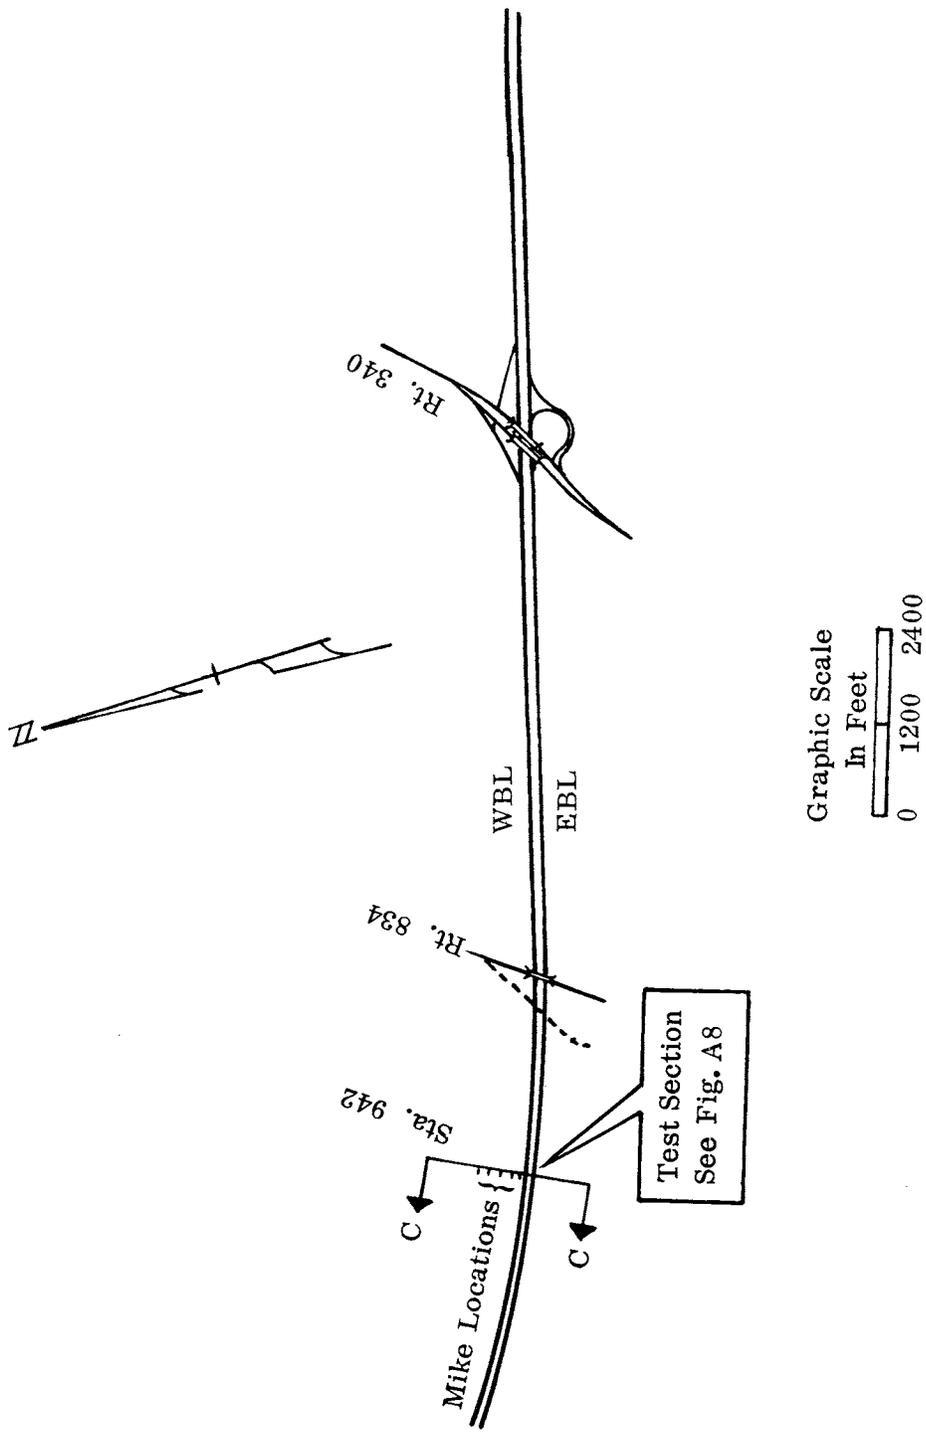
Plan of Site 3 on I-64 at Sta. 942, near Fishersville, Augusta County.
